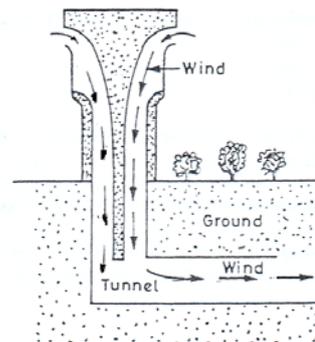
The cross sectional view of an earth tunnel and wind tower
